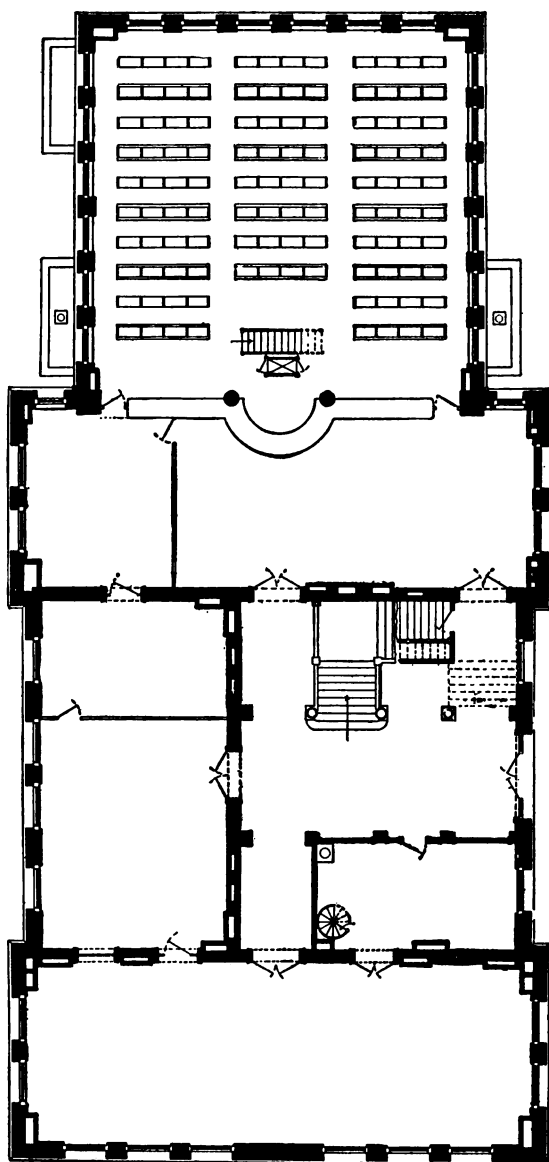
Ground floor plan of the Pratt Institute, Brooklyn.
